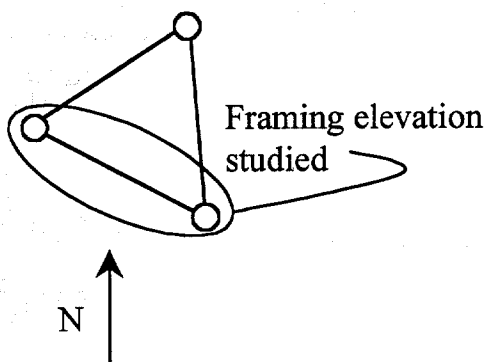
Santa Fe Jacket Orientation (Plan View)
